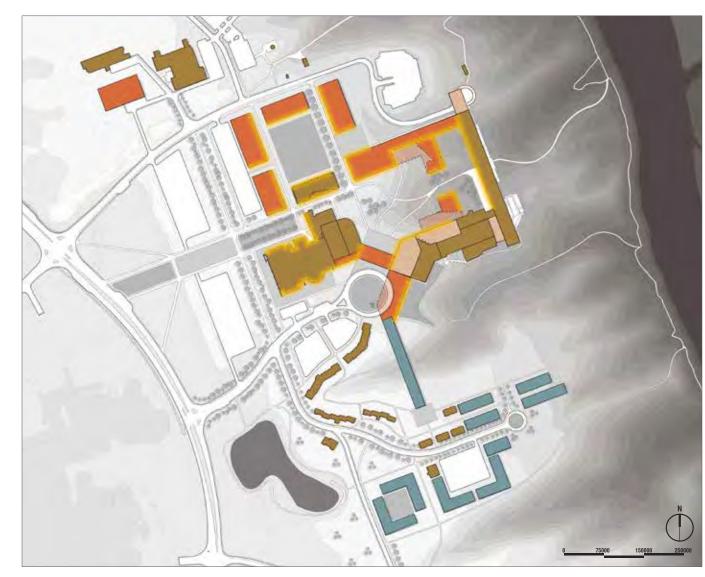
| DEMONSTRATION PLAN: EXISTING & PROPOSED BUILDINGS
